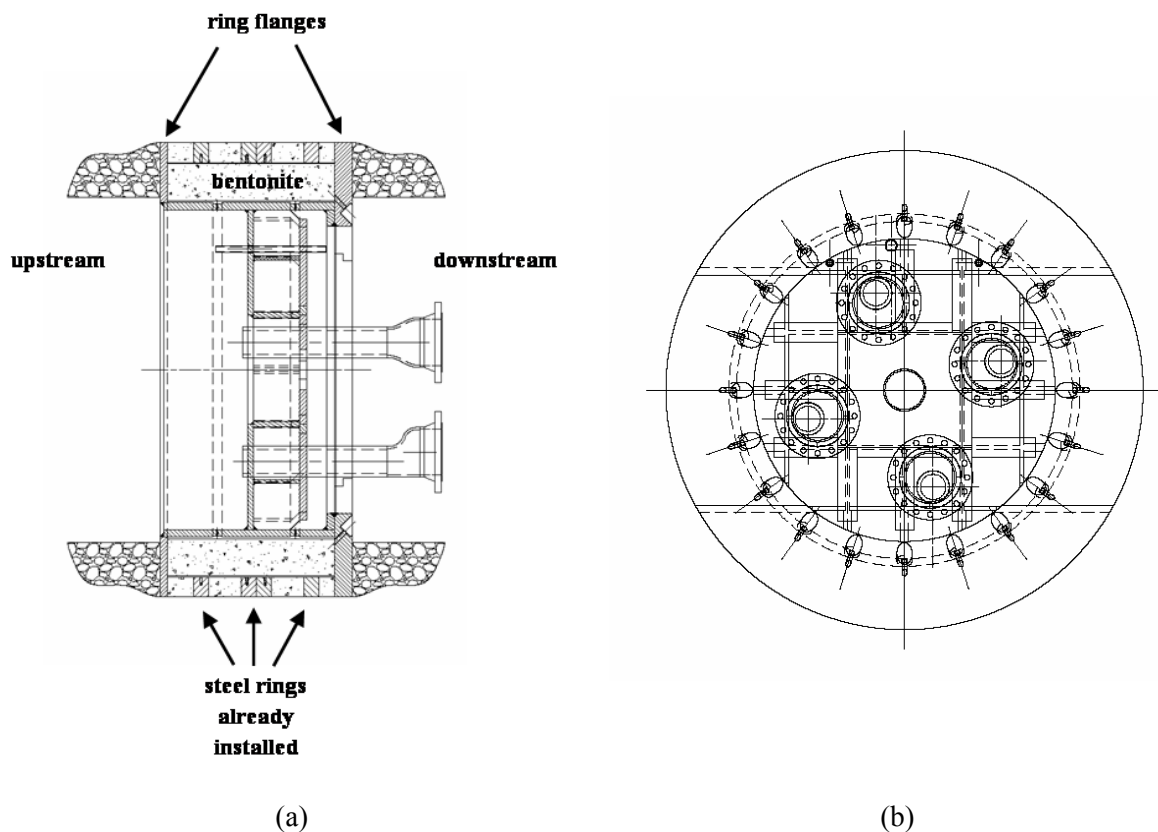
General design of the seal: (a) axial cross-section, (b) view from the downstream side
